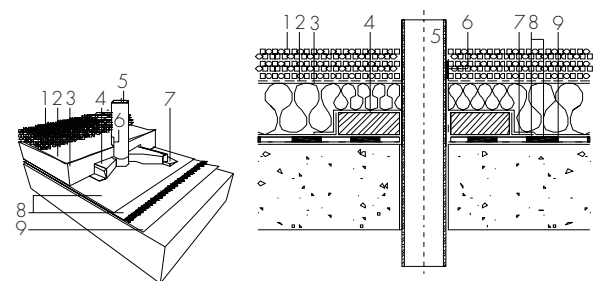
Installation of the Hydrosshield system (all dimensions in mm)
